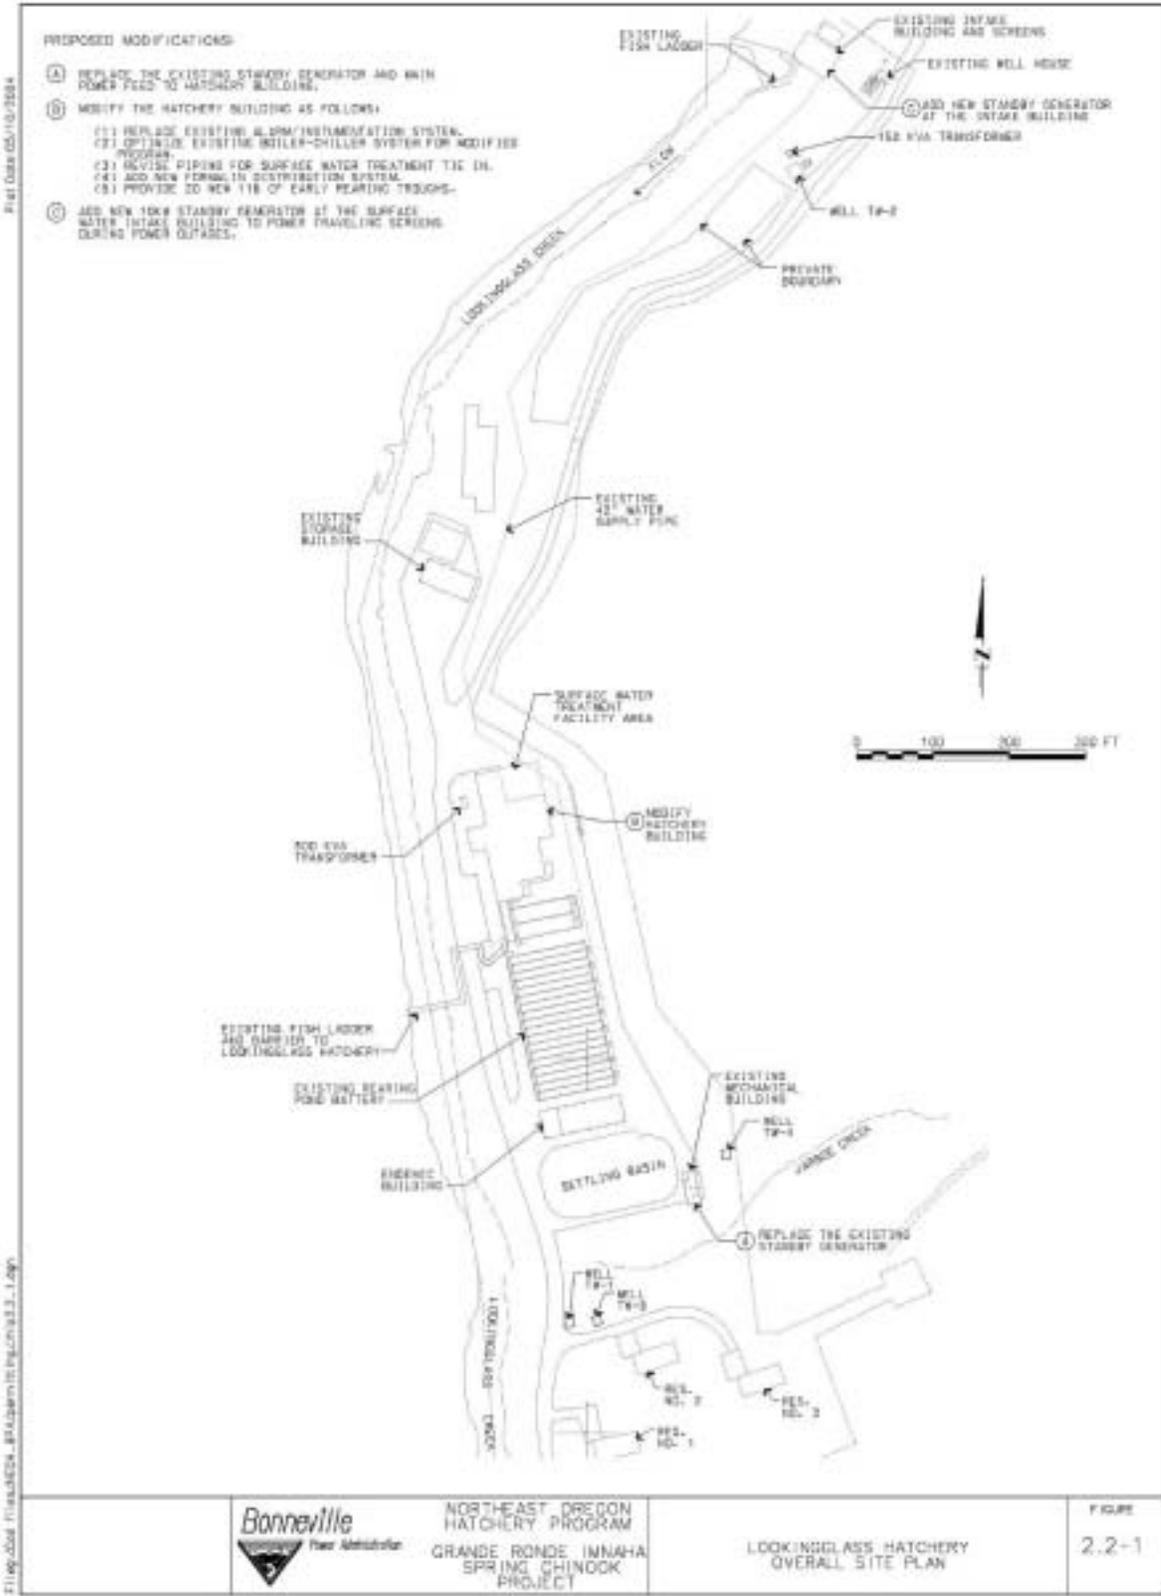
Lookingglass Hatchery Existing and Proposed Site Plan.
